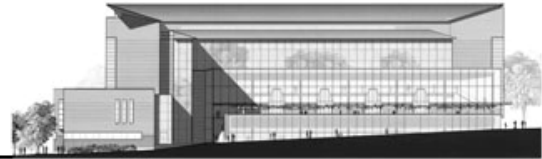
Brotman Galleria Typical Bay Interior Elevation
